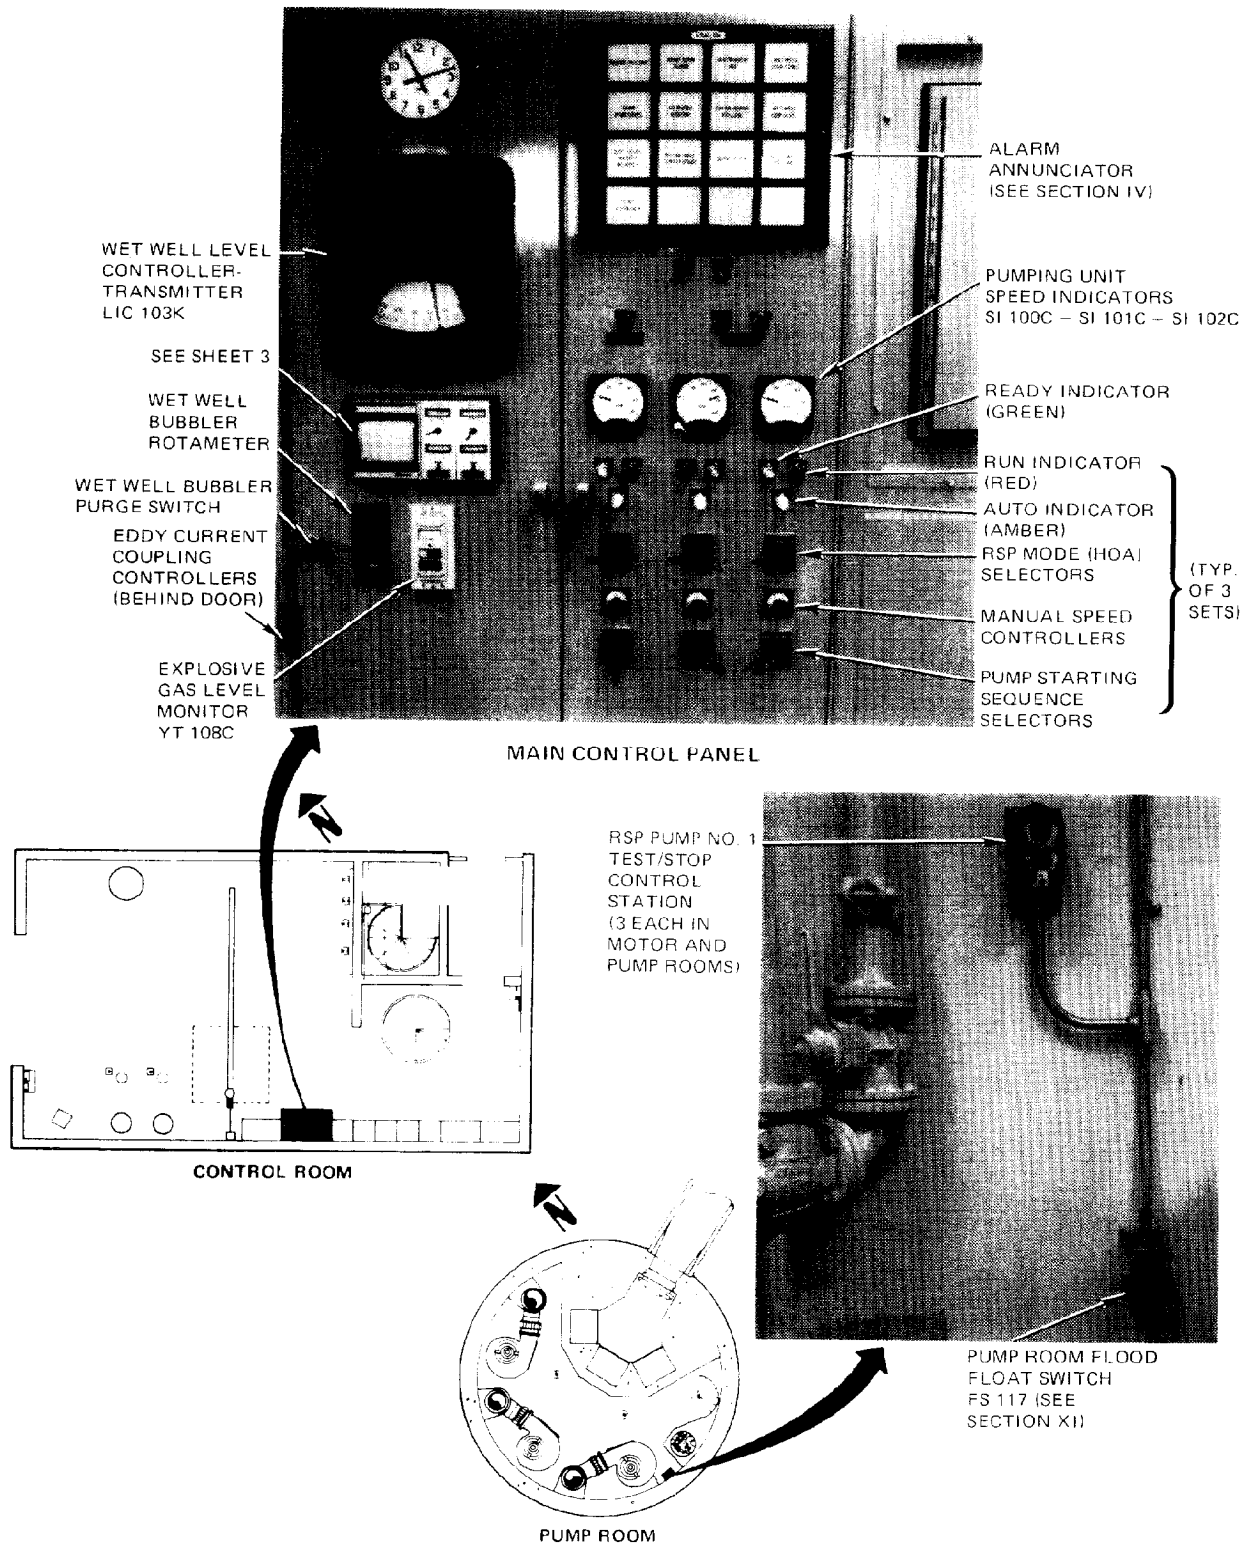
Raw Sewage Pumping System Equipment (Sheet 2 of 5)
